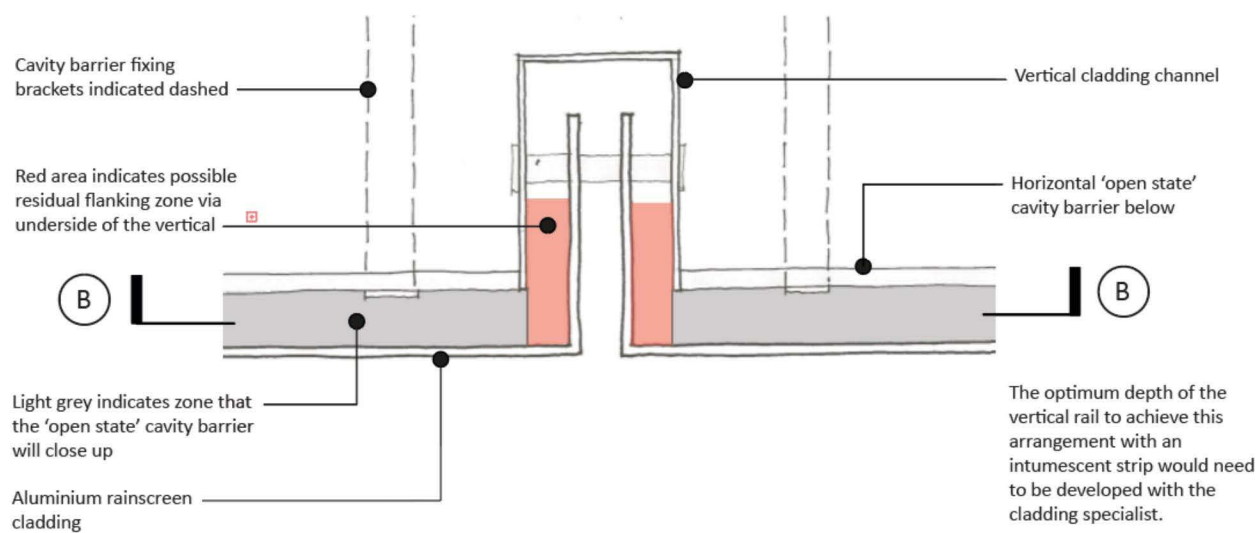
Typical Detail 4—Plan detail through: spandrel / column interface where column aligns with compartment wall
